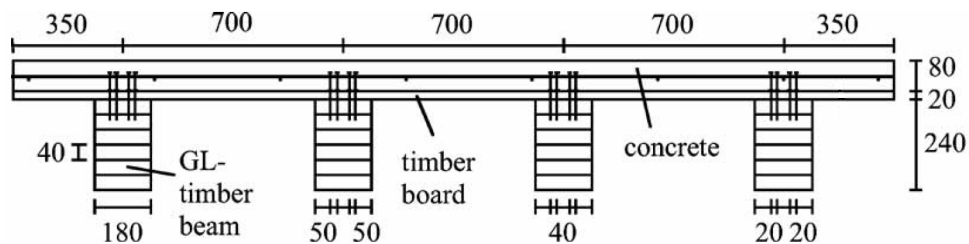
Cross-section of the timber-concrete composite slab tested under ISO fire exposure
